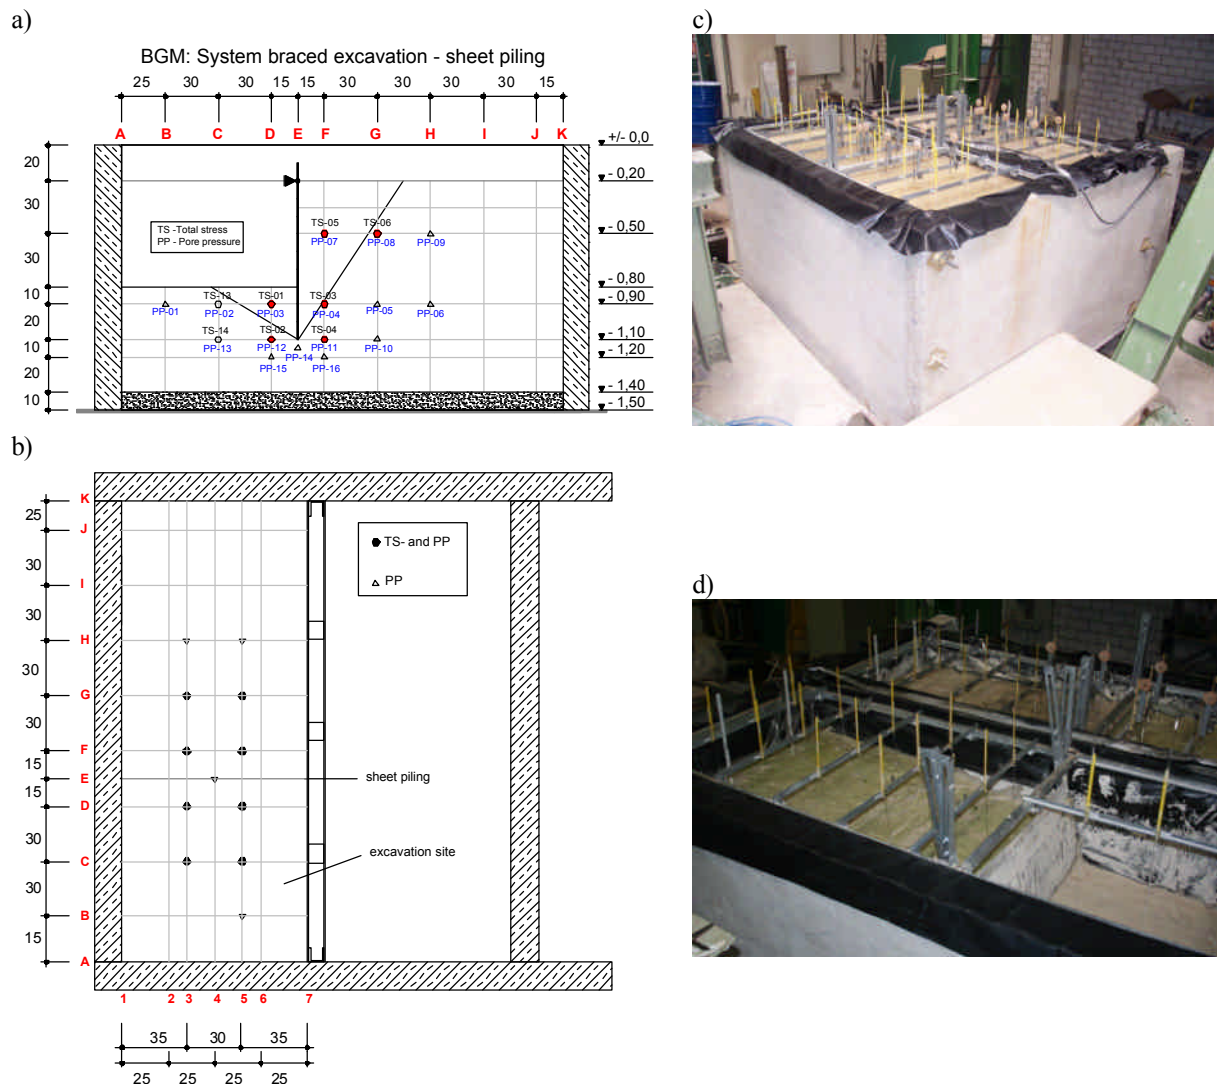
Large scale model test arrangements (a) cross section and (b) top view, (c) picture before and (d) after excavation
